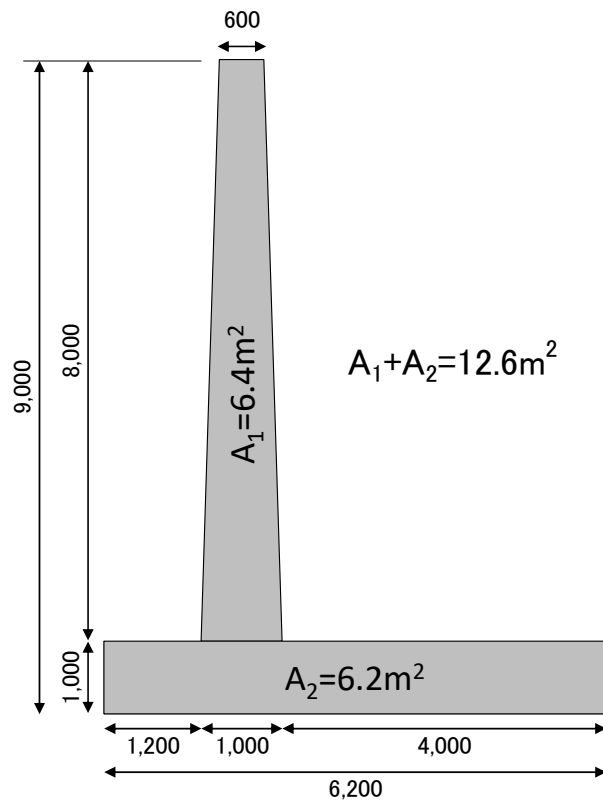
A Flood Wall (Wall in the shape of an Up-Side-Down T), Transversal Section
